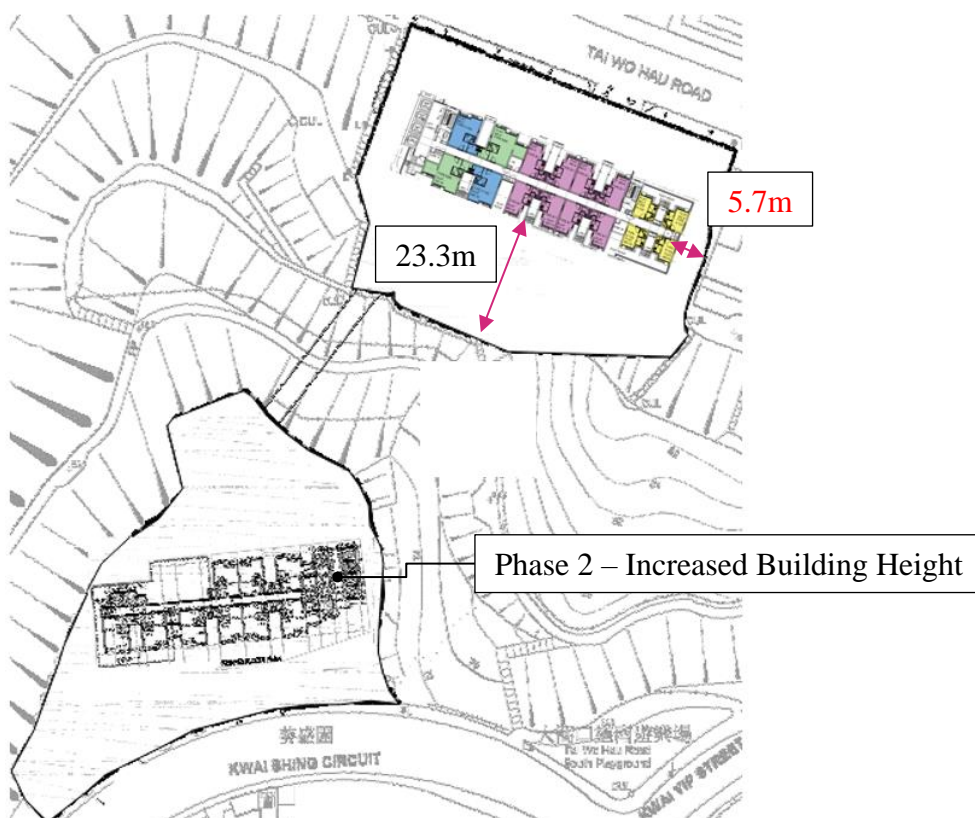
Typical Floor Layout Plan of Proposed Scheme
